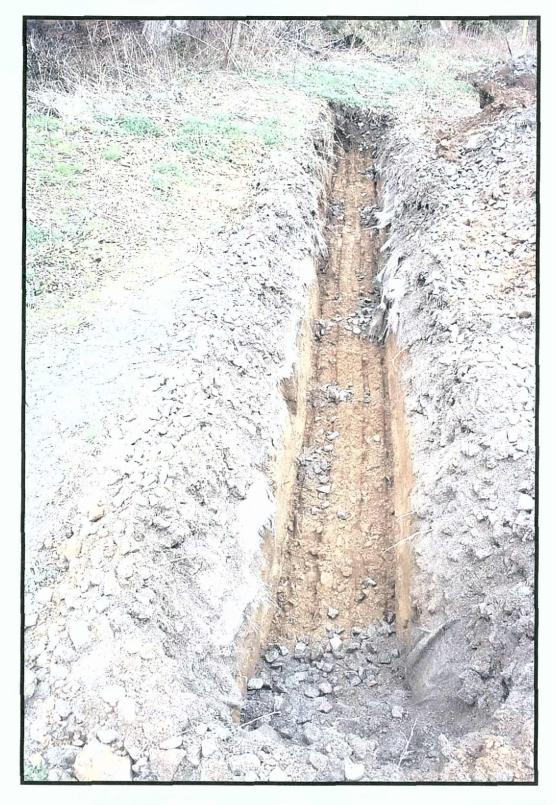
Backhoe Trench 4 - View North From Southern End of Trench
